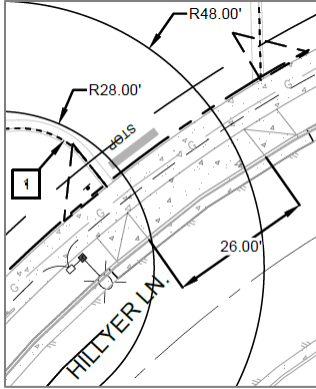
Sheet C5.1 Fire access plan excerpt
